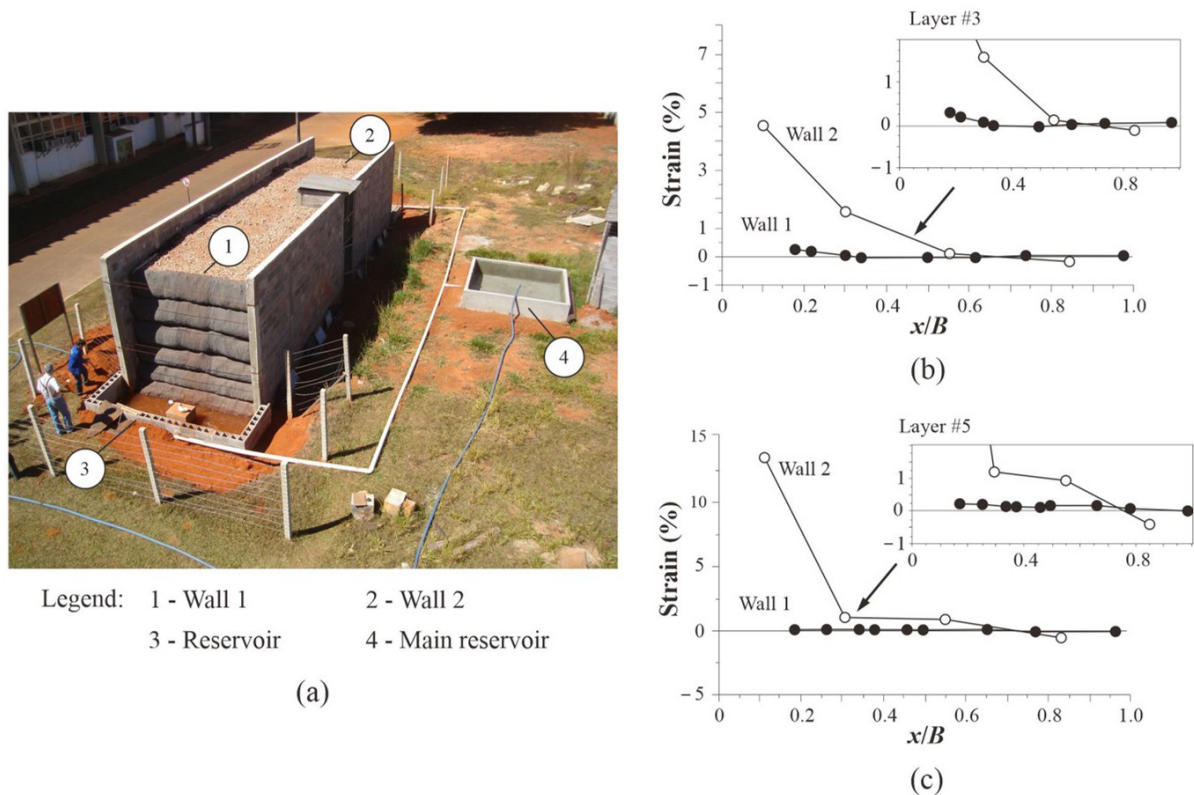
Geosynthetic reinforced walls with RCDW backfill: a) View of test facility; b) Reinforcement strain in Layer #3 (elevation of 1.2 m) after inundation; c) Reinforcement strain in Layer #5 (elevation of 2.4 m) after inundation. Note: x = distance to the wall face, B = reinforcement length. (Modified from Santos et al., 2014).
